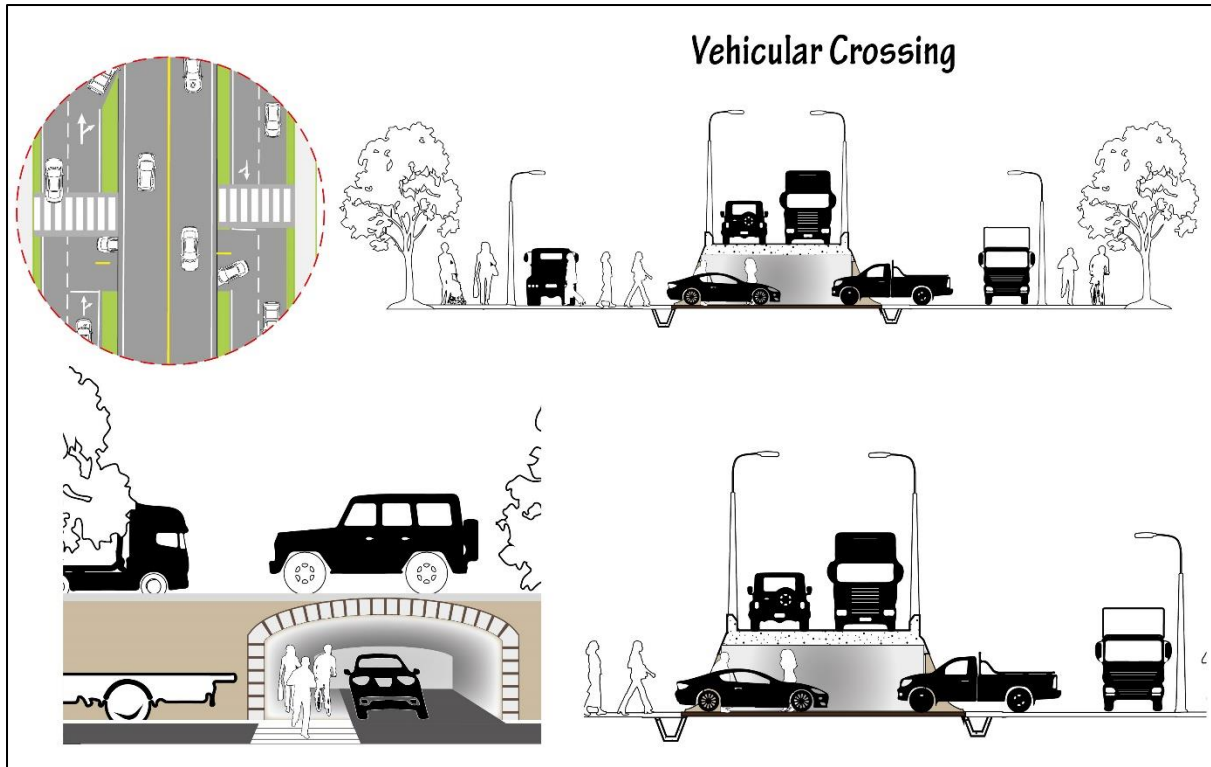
proposed vehicular crossing tunnels for Namanga road
